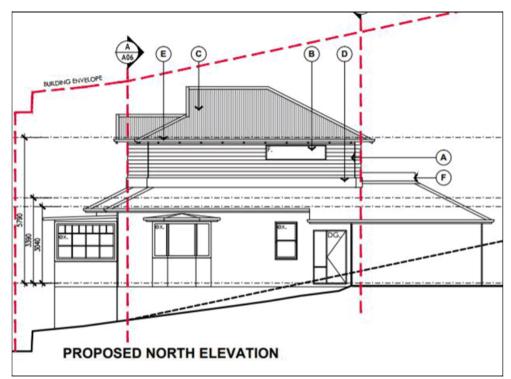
Proposed right hand side elevation, facing 106 Regent Street.
